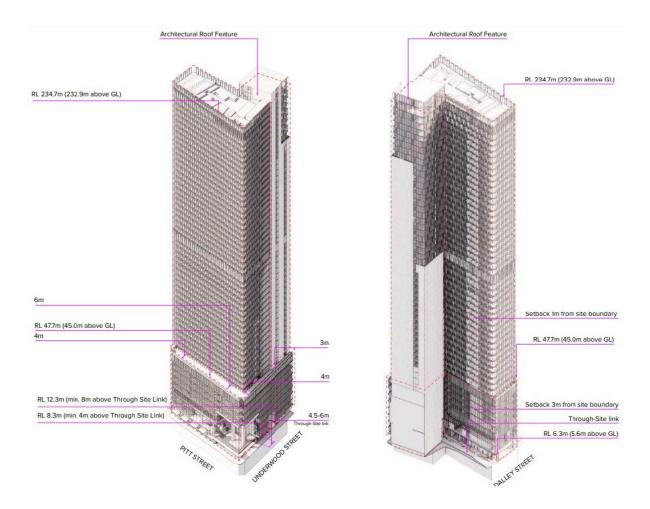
Proposed building tower height, podium height, setbacks and through site link dimensions
